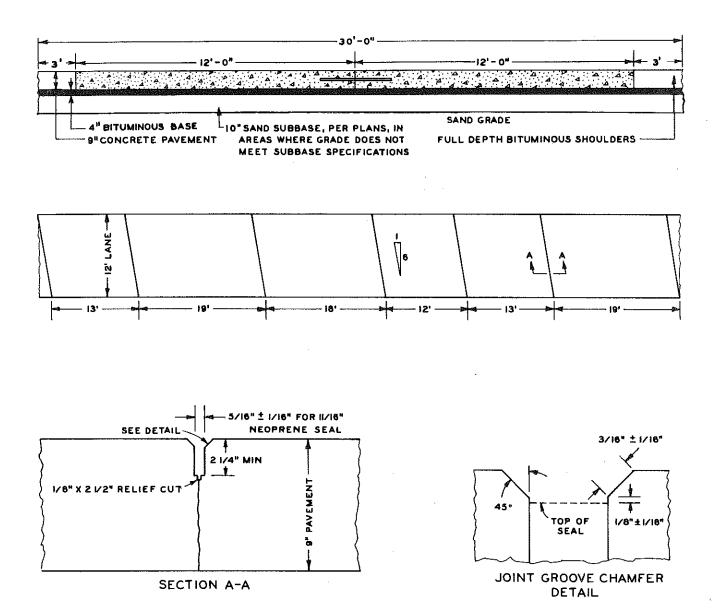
Type D, short slab, plain concrete, skewed joints, variable spacing, no load transfer, bituminous base and neoprene seals.
